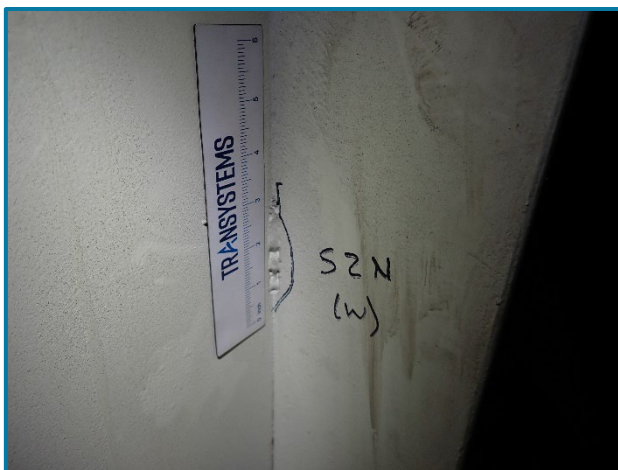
Typical tack weld to the transverse stiffeners on the interior of Pier Cap 1A (looking northeast).
